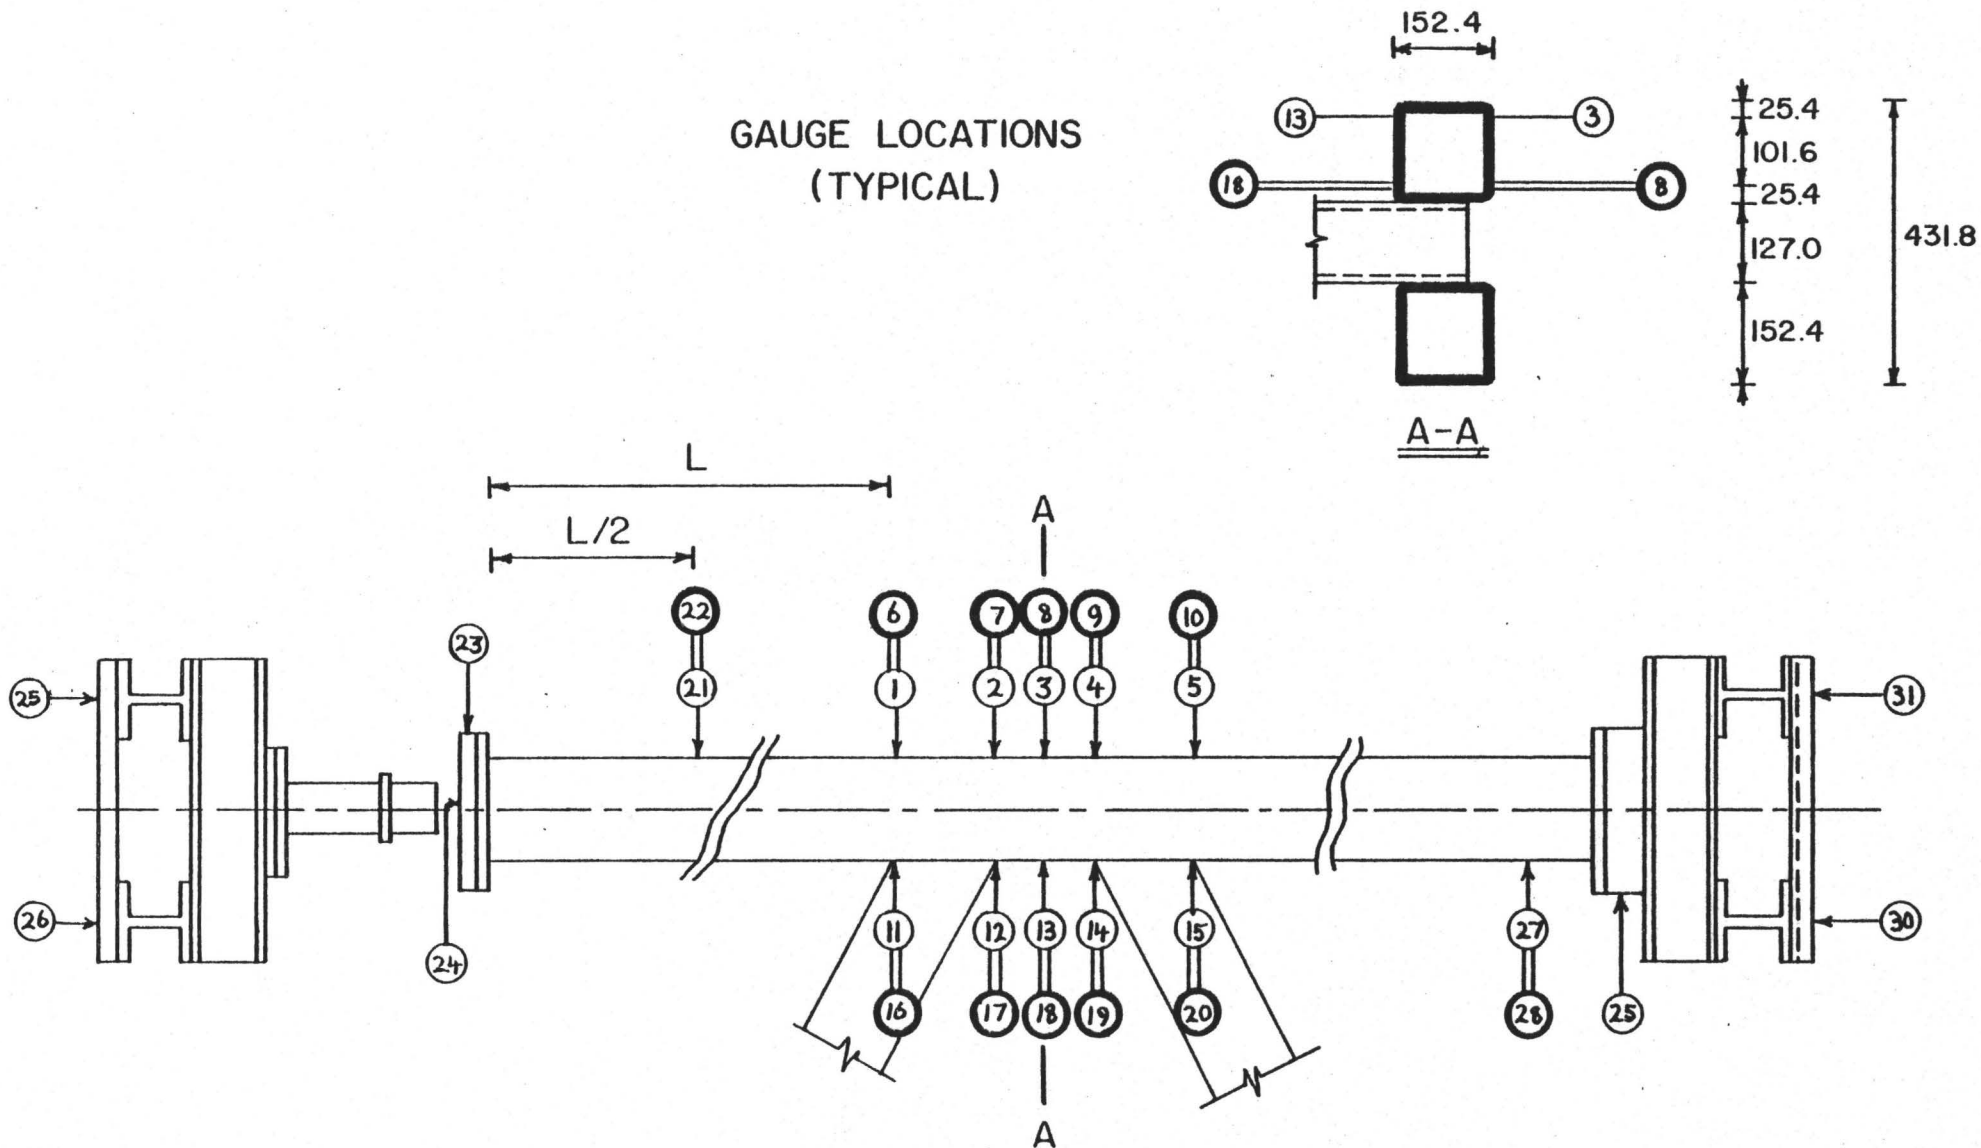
DIAL GAUGE ARRANGEMENT (DIMENSIONS IN mm).
